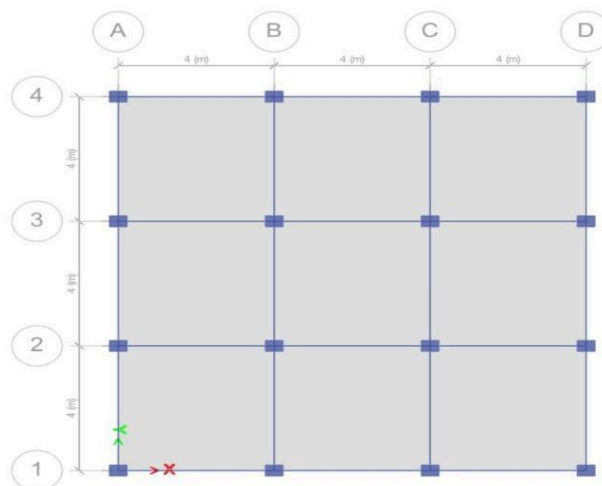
Typical Floor Plan for both M1L5 and M2L10 models
